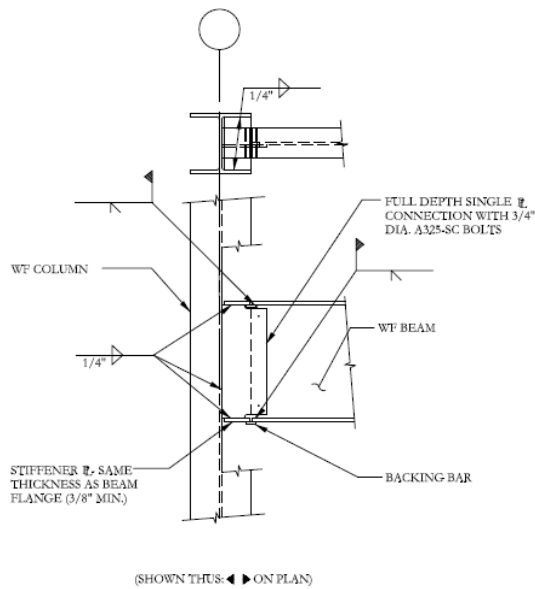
Existing Steel Structural System Column Web Moment Connection Detail
